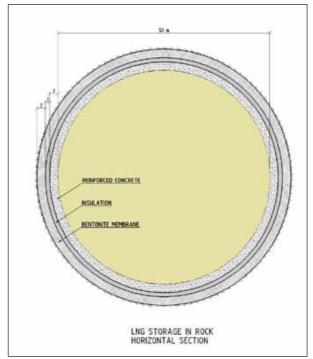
Underground storage of LNG developed by Norconsult AS, horizontal section. (Illustration: Norconsult)
